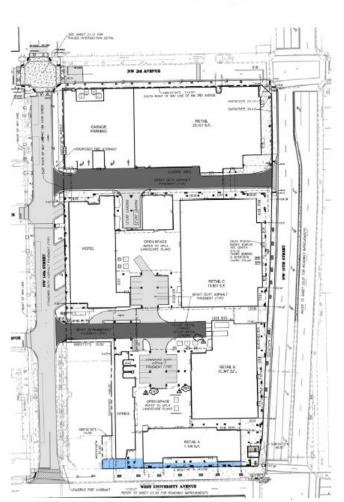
" - UNIVERSITY AVENUE (ON-SITE) 1. Unit Pavers
